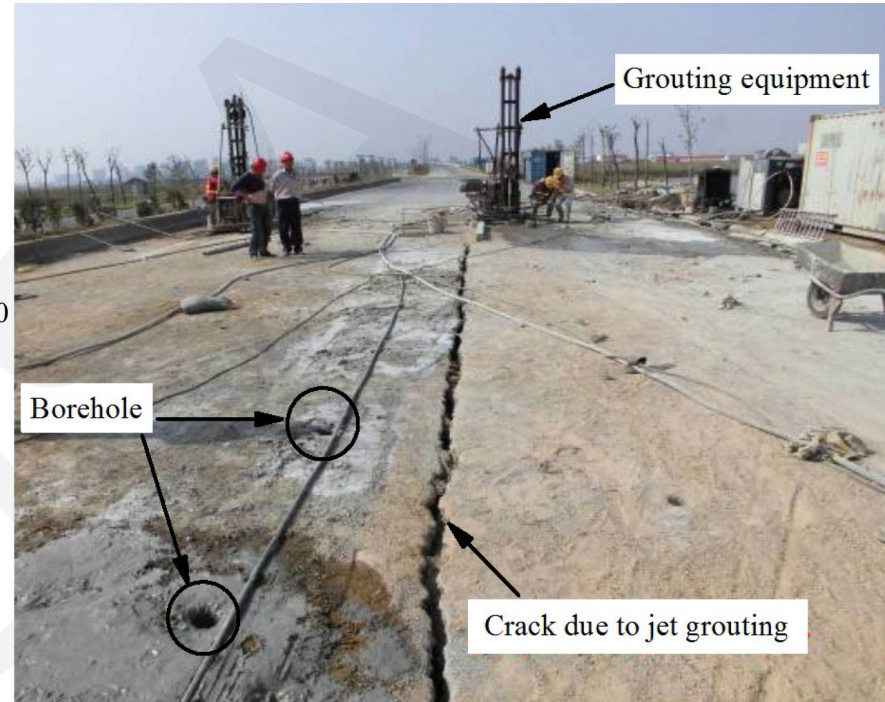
Crack due to jet grouting on the Linhai highway
